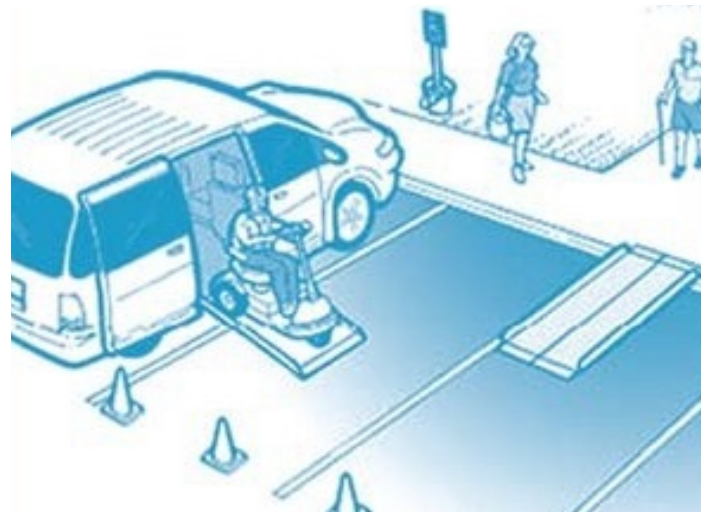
Three standard parking spaces are converted into an accessible parking space with an access aisle. Cones mark the access aisle, and a temporary curb ramp with edge protection connects to an accessible route to the voting location.
